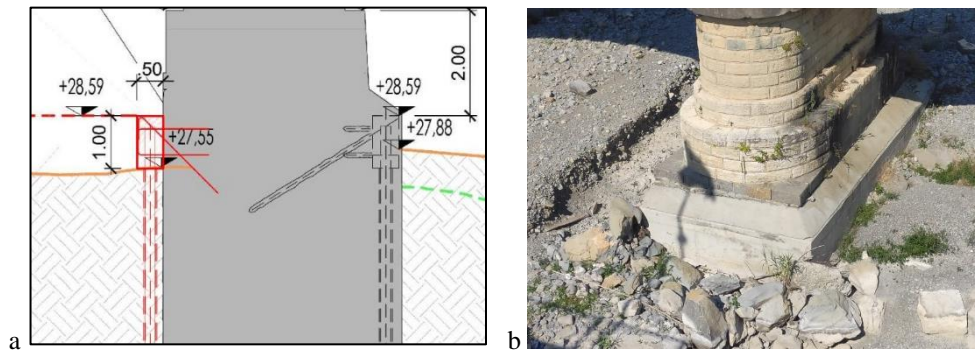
(a) Mitigation measures against fluvial erosion on Bridge n° 1 on torrent Bevera – an extension of the concrete curb on micropiles on the left side of the pier’s foundation. (b) Example of pier’s foundation: the right side protected by a concrete curb on micropiles and the left side affected by erosion phenomena.
